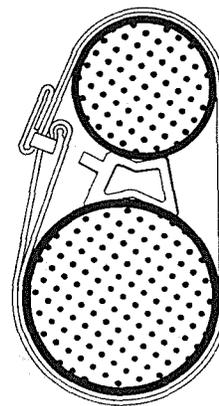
Complete Installation—Lashed Cable Support and D Cable Spacer
